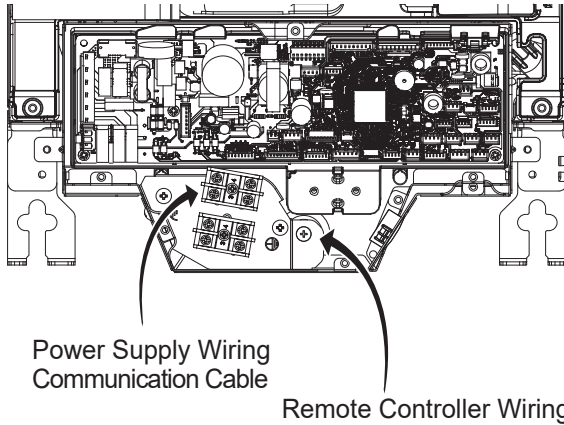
TC Frame One-Way Cassette Wiring / Cable Routing, Side View.
